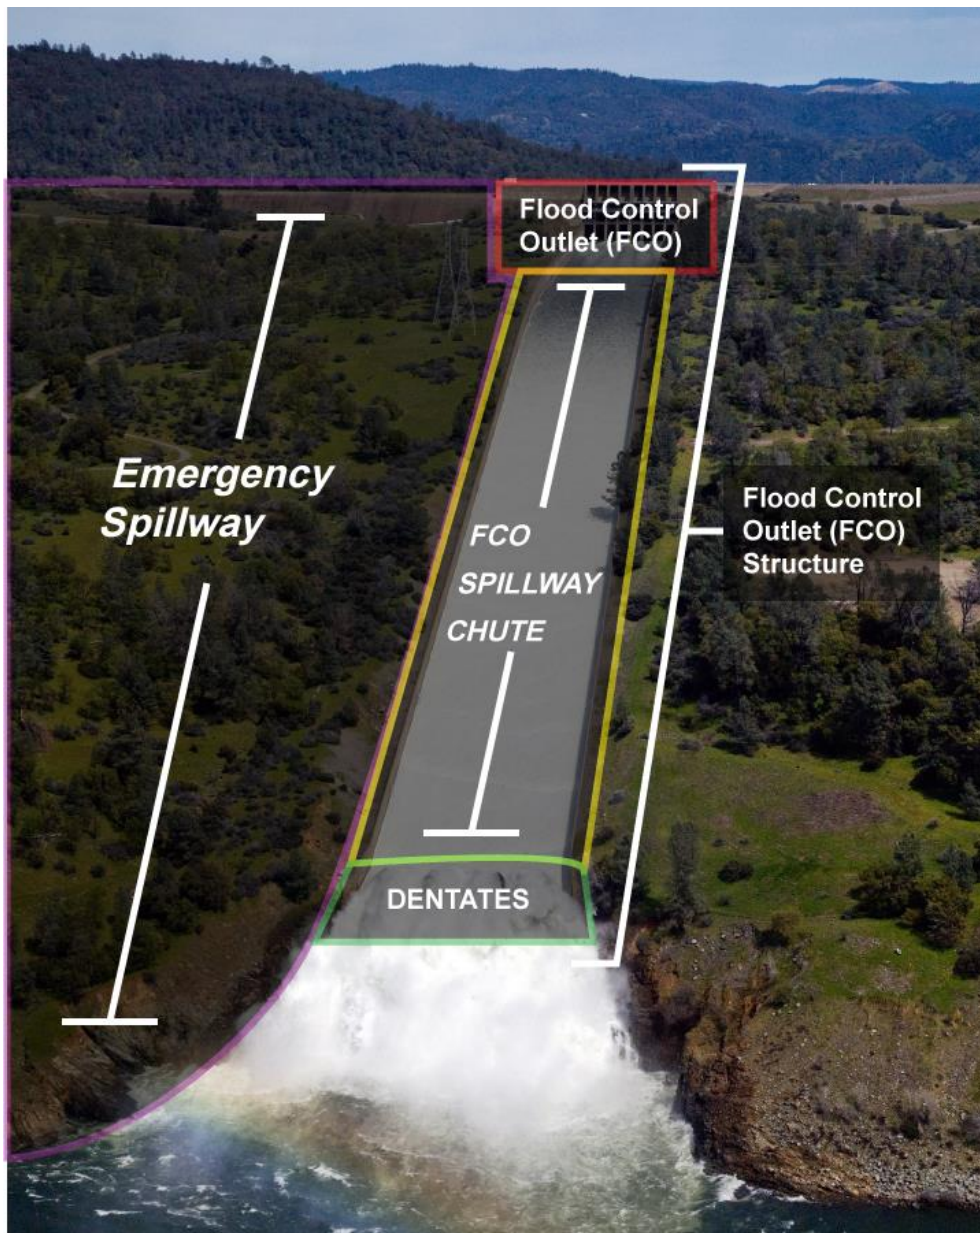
Flood Control Outlet (FCO) Structure and Emergency Spillway, March 2011
